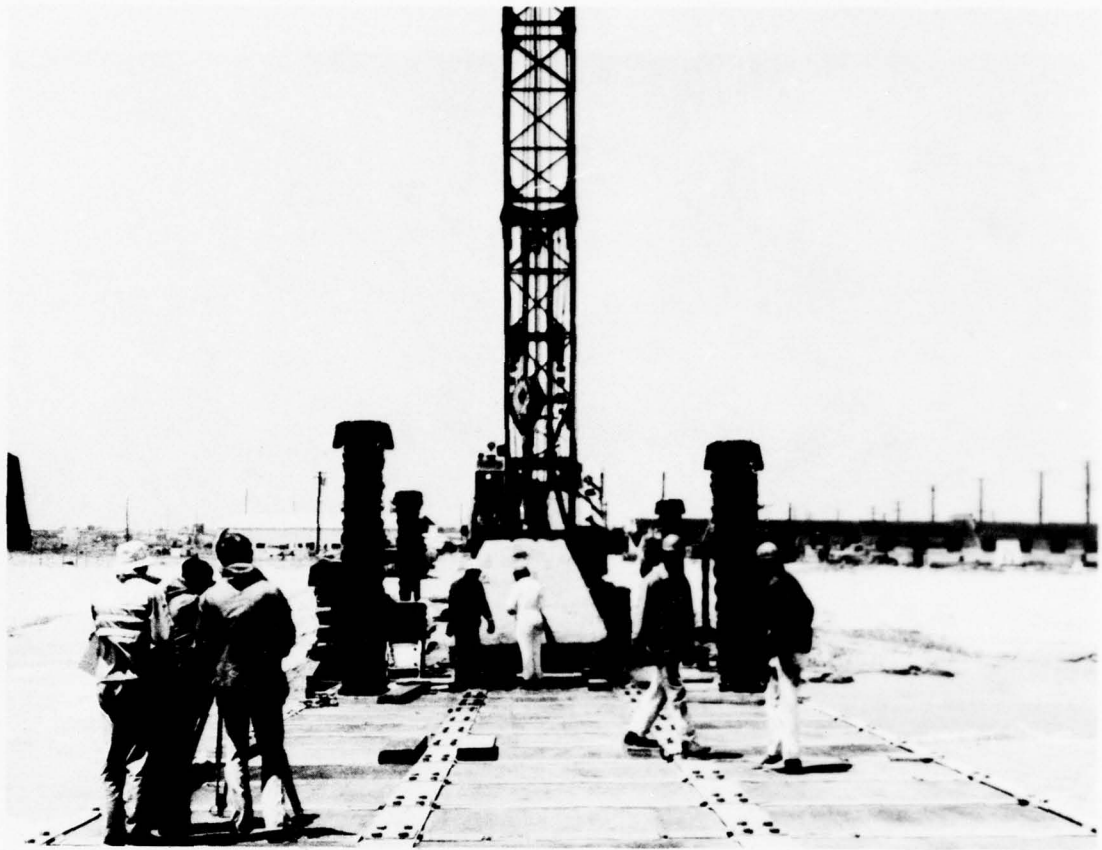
Concrete block weighing 30,000 pounds (13,600 kg) used to load causeway.
